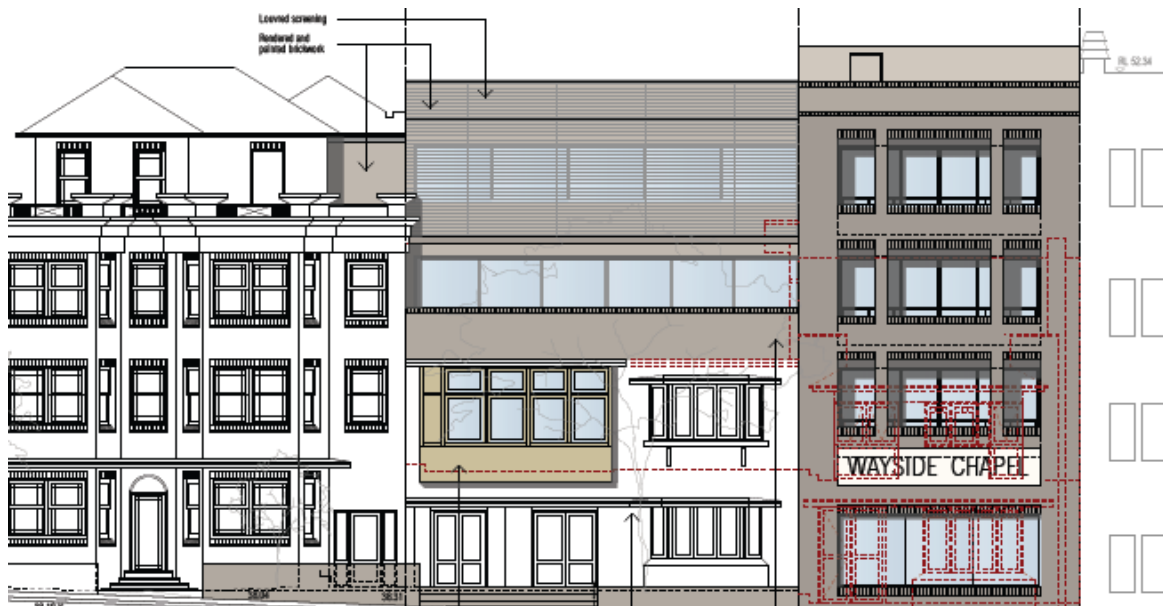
Plant room reduced in size and massed to the west of the roof. Solar panels set in rows below the level of the parapet.
